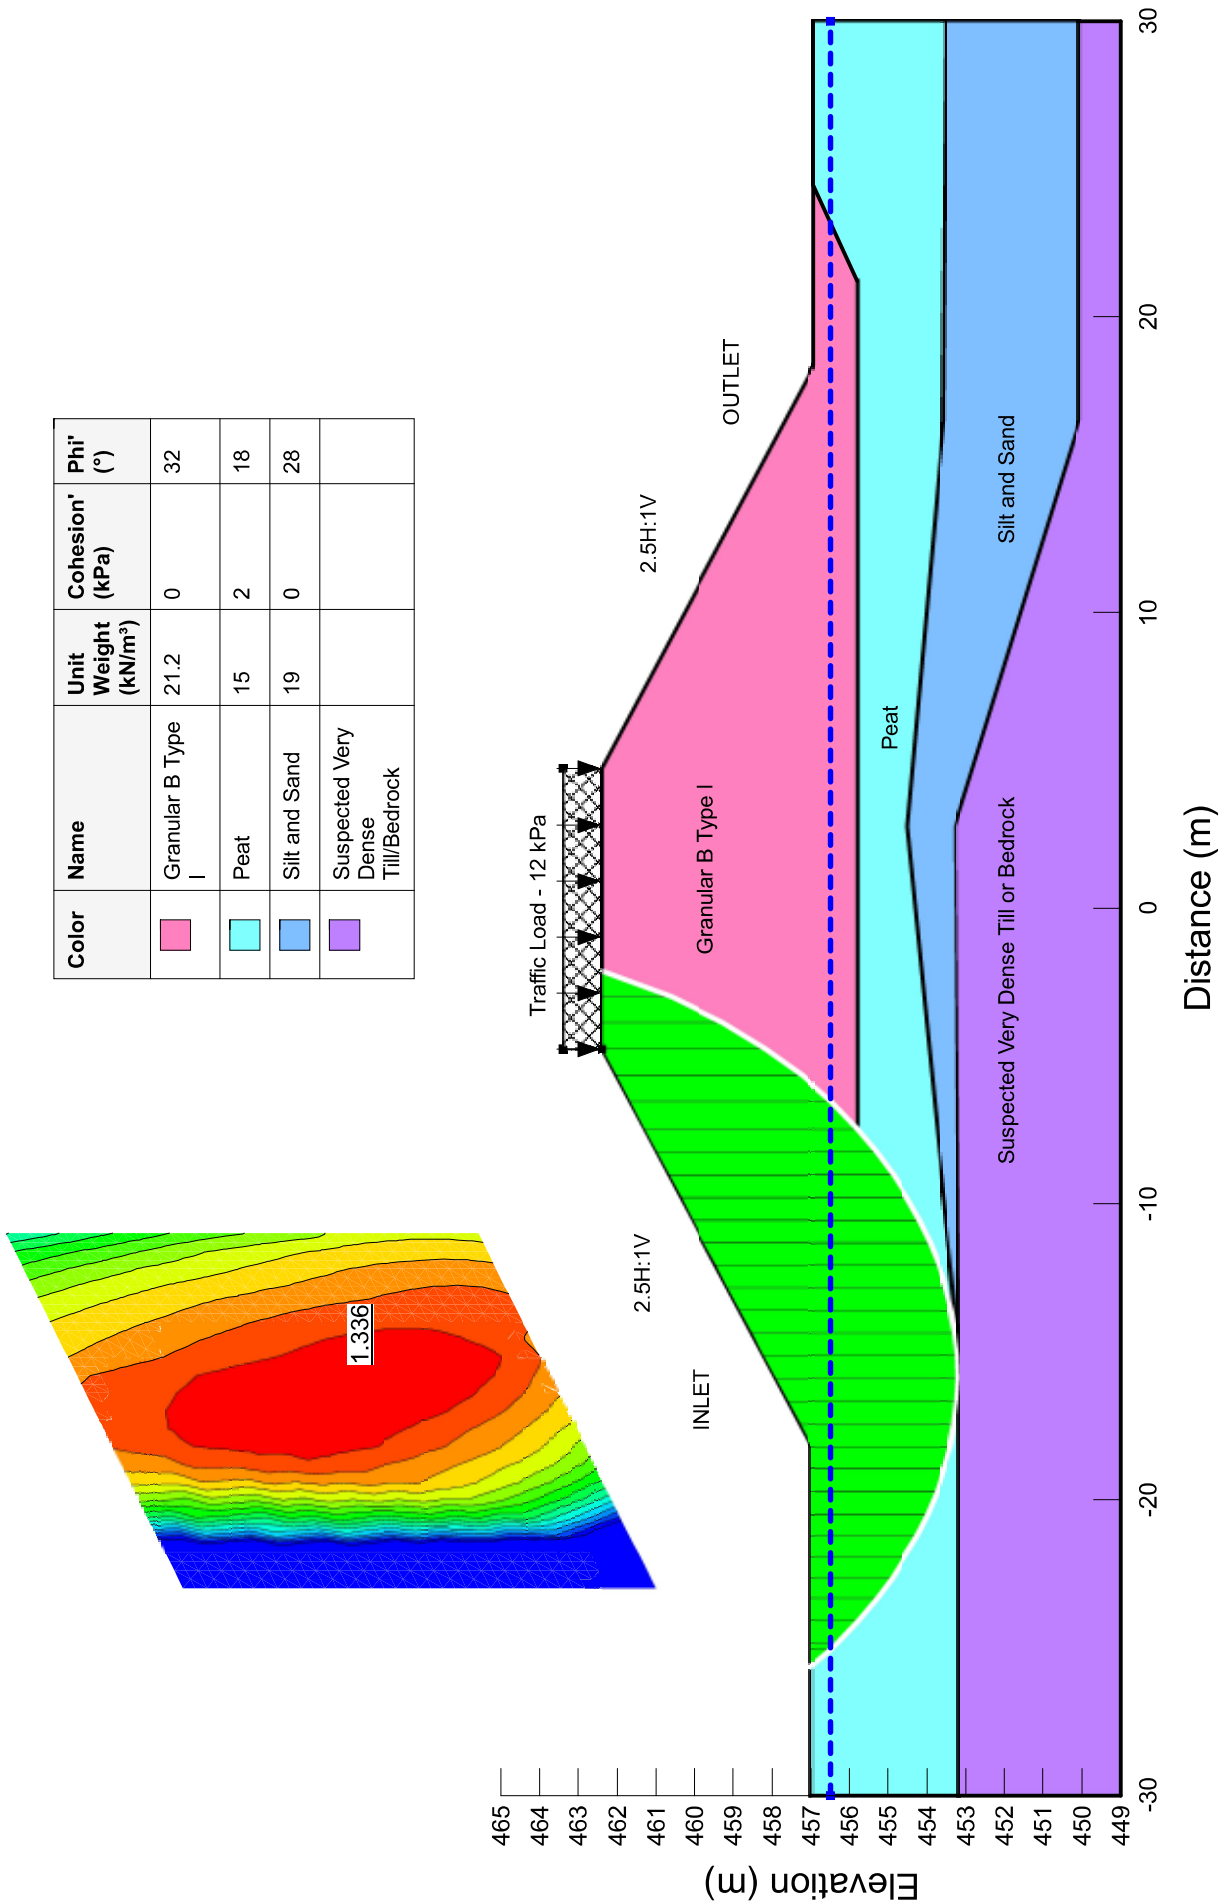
Proposed Embankment Stability - Inlet Side - 2H:1V Side Slopes
